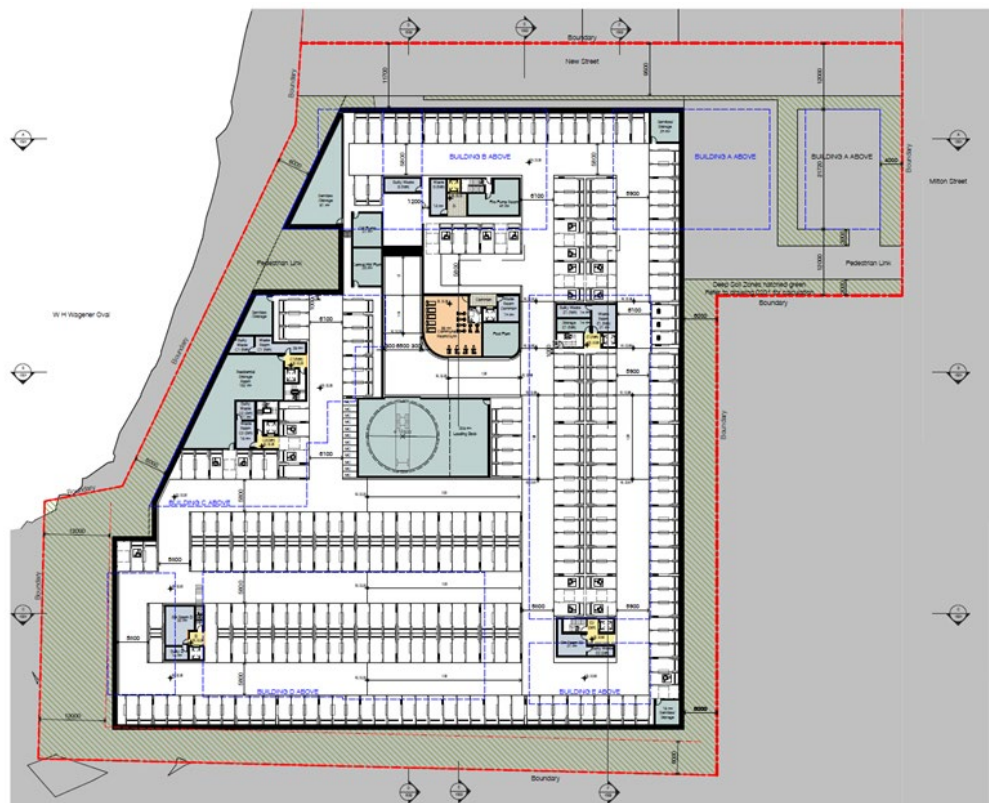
Proposed Overall Basement Level Plan. (Source: SJB Architects)
